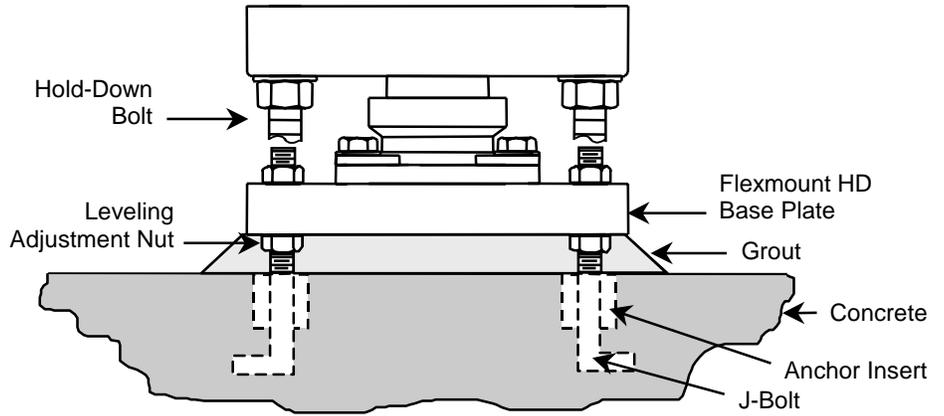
Base Plate Bolted to Unevel Concrete Floor
